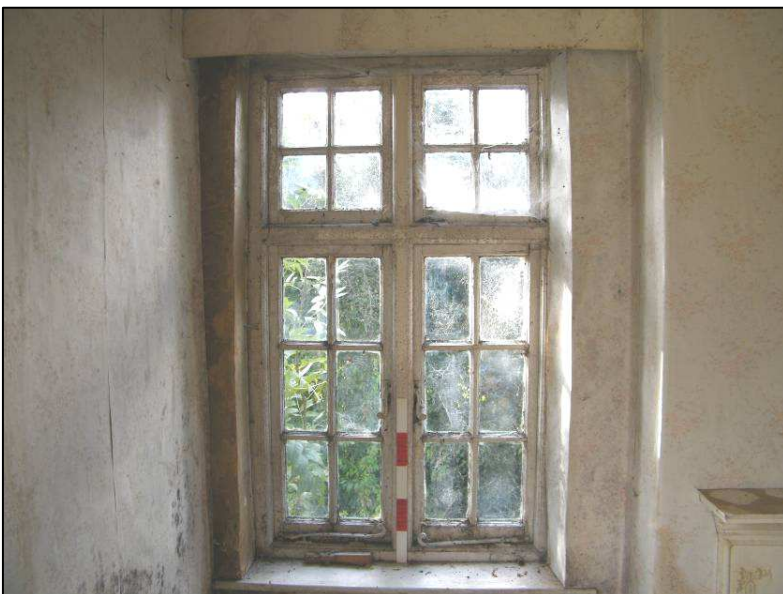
(Shot 72): Detailed shot of original window in bedroom 2, looking southwest. Scale is 0.5m
